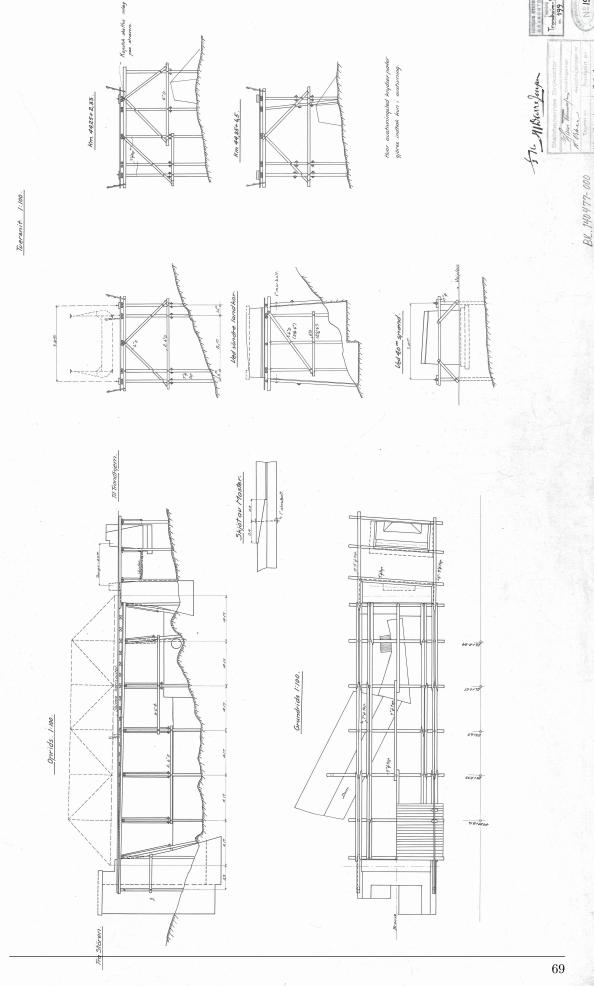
construction drawing showing section dimensions for lerelva bridge
